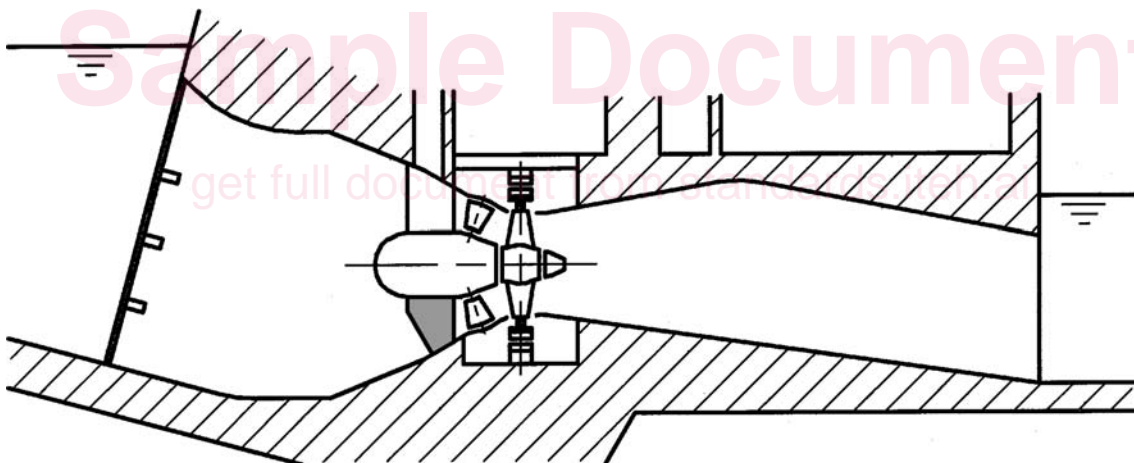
Rim-generator unit The generator rotor is directly attached to the runner periphery. The Straflo^{®1)} turbine is part of this type of unit.
